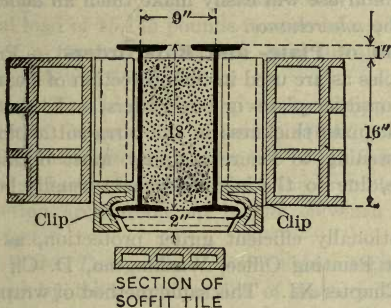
Double I-Beam Girders projecting below Ceiling.
